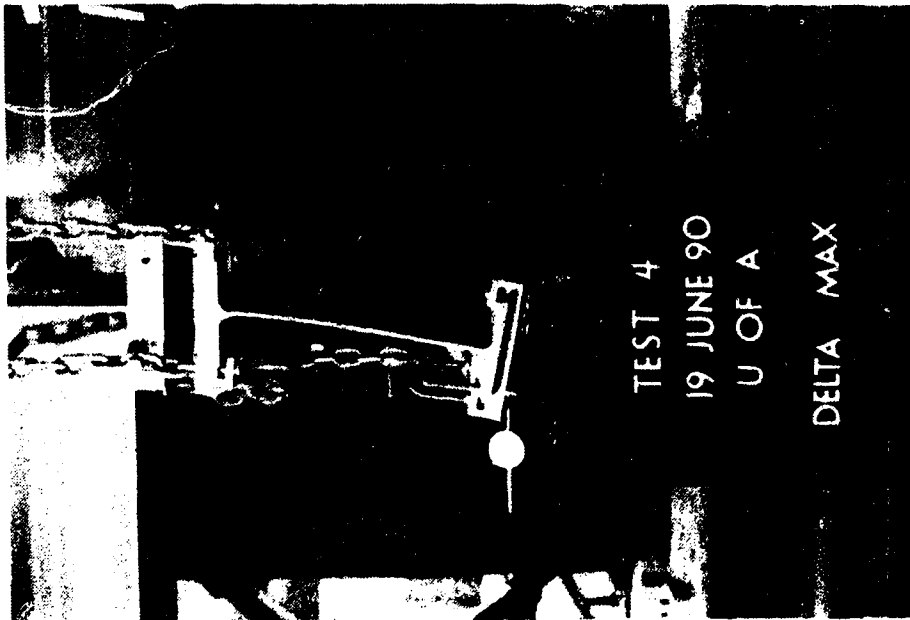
End view of distorted cross section at the cantilever tip, test 4
